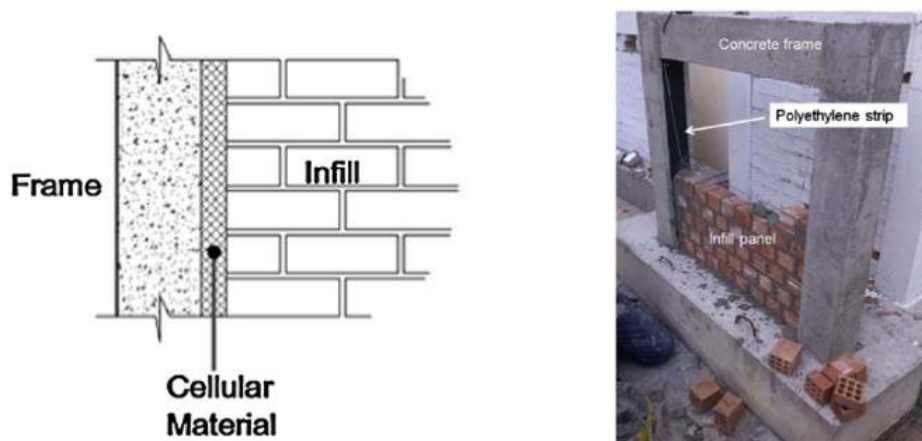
Frame-infill joint detail (left) and construction process (right) [adapted from Tsantilidis et al. (2018)].
